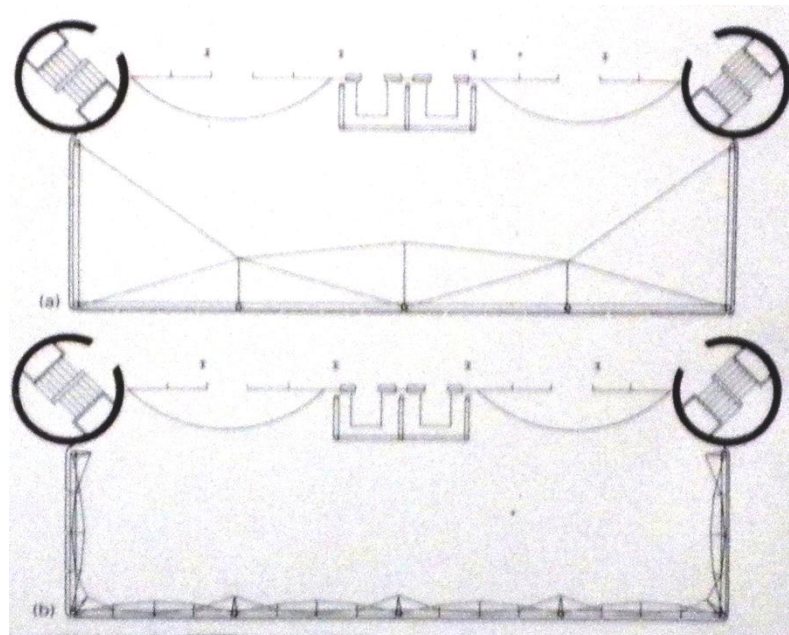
Plan View of Parc de La Villette of System (Alan, B., and Chris, G 1996).
